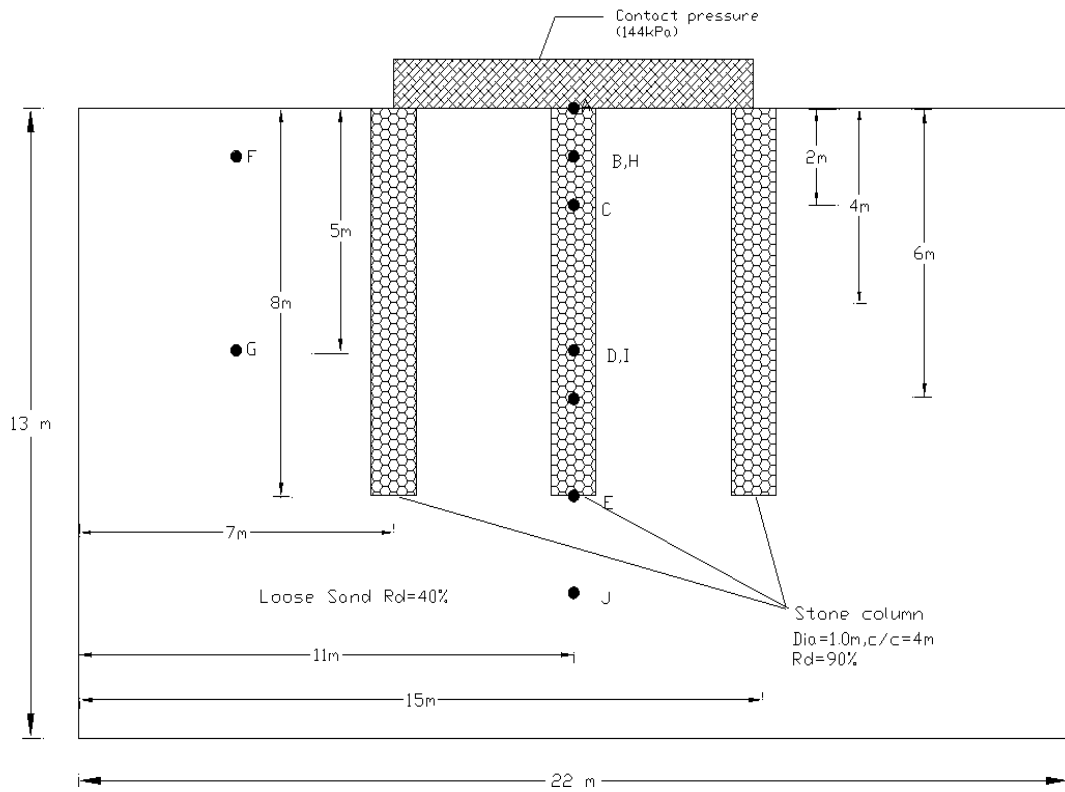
(g) Benchmark model with Footing and stone Column (Cross-section)
